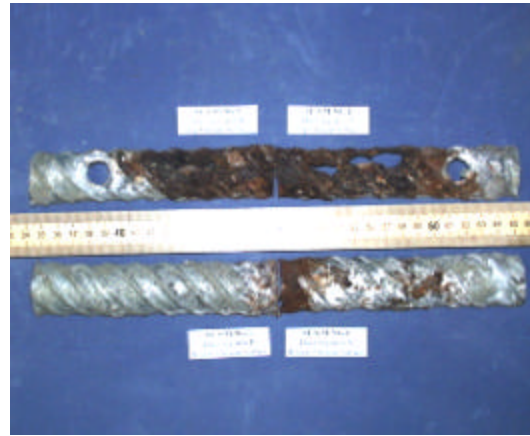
Concrete, Duct, Strand and Bar Condition for Specimen SE-S-L-NG-1.
